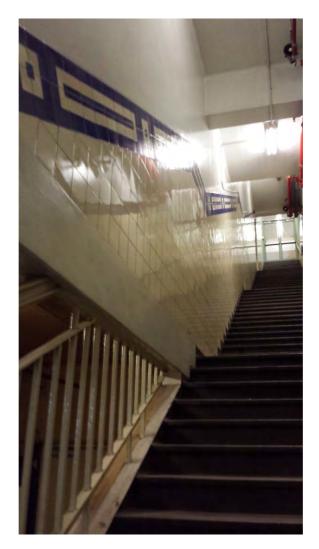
Transport House, western fire stair, basement Level 3 to York Street foyerWynyard Park
